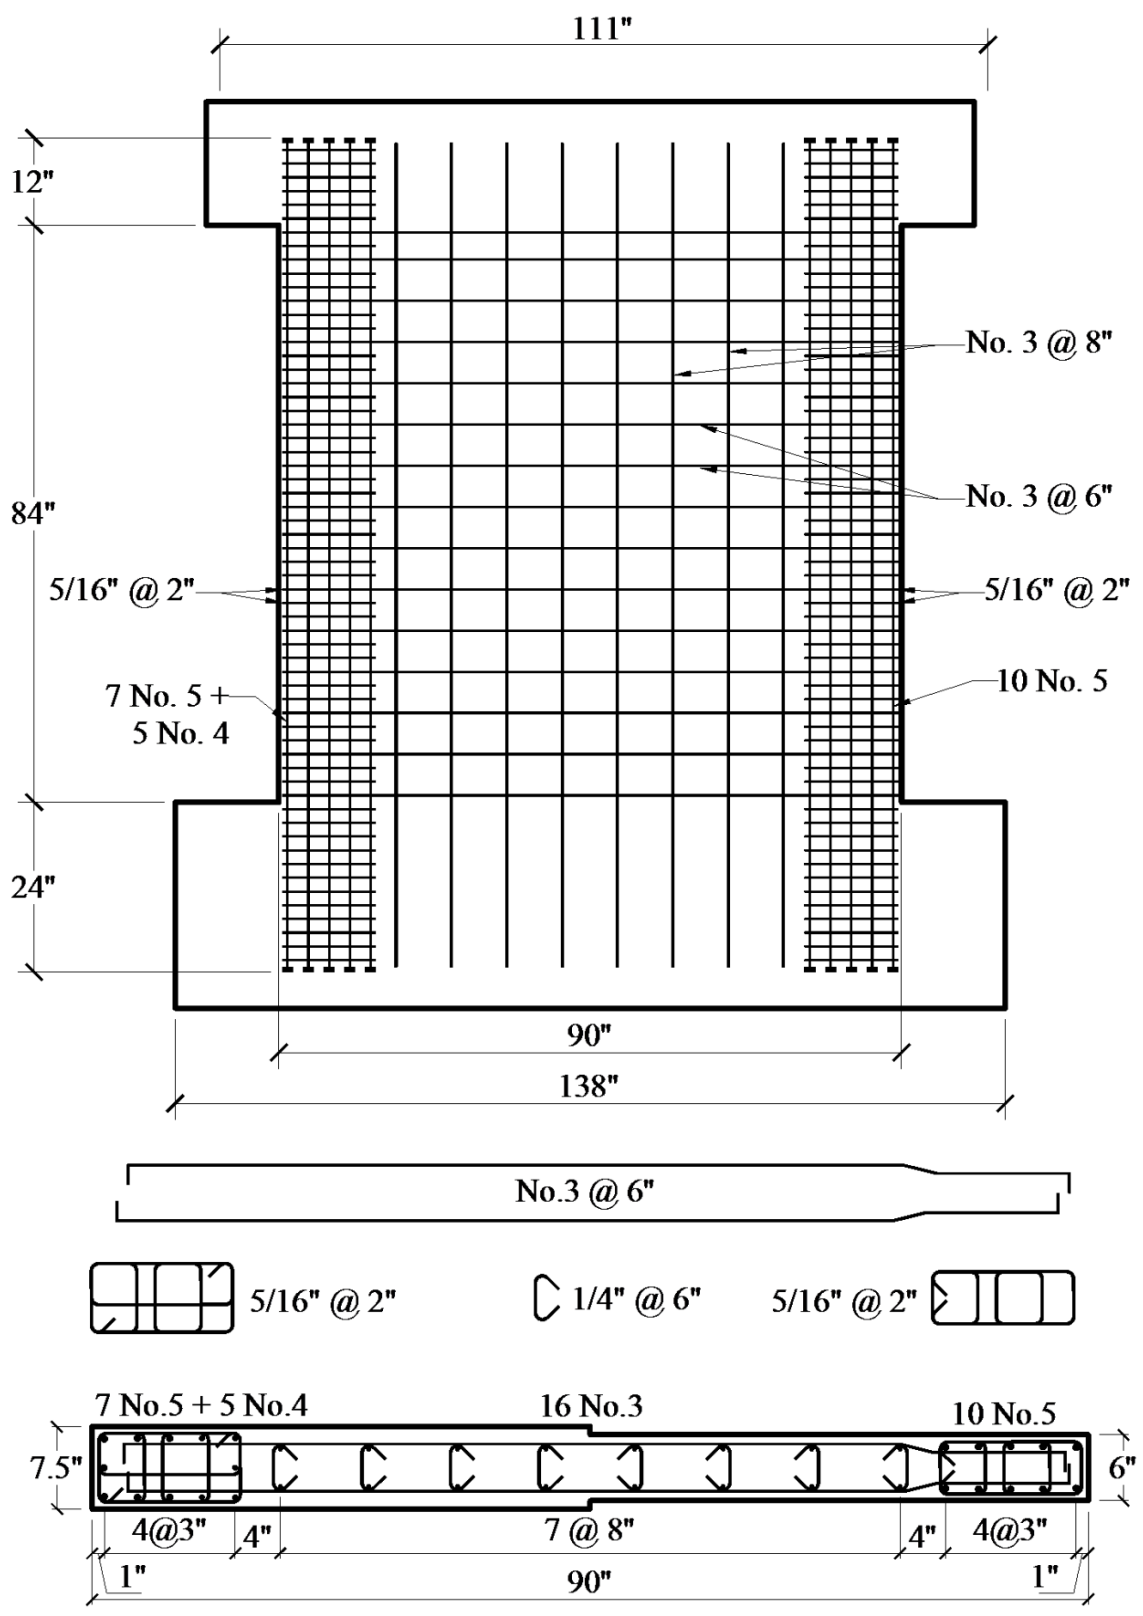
Specimen WP5 reinforcement (Conversion: 1"=25.4 mm)
